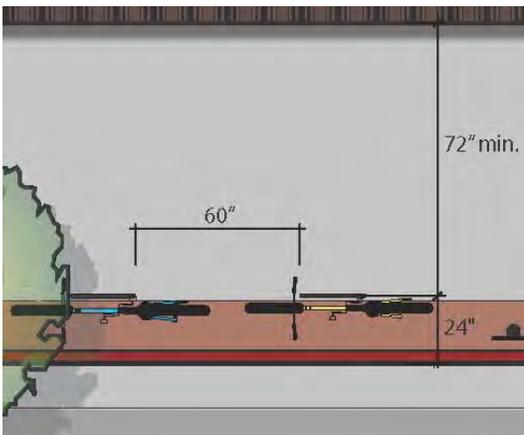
Recommended configuration of a staple bicycle rack on the sidewalk
